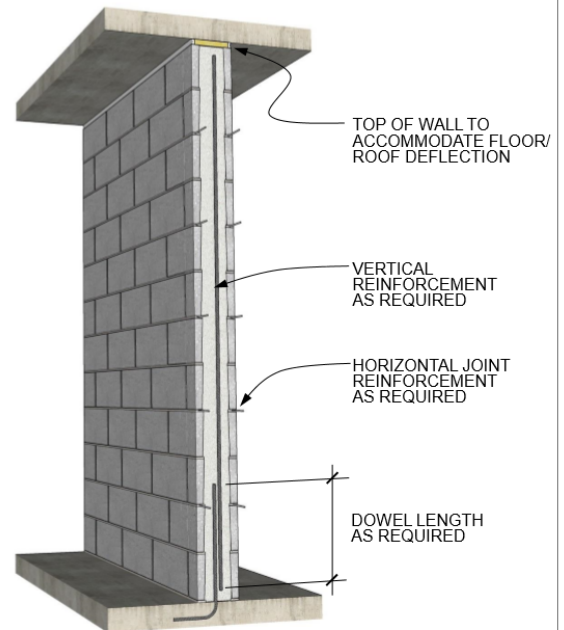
Cantilevered Wall Detail from IMI Masonry Detail Series, <http://imiweb.org/masonry-detailing-series/>
